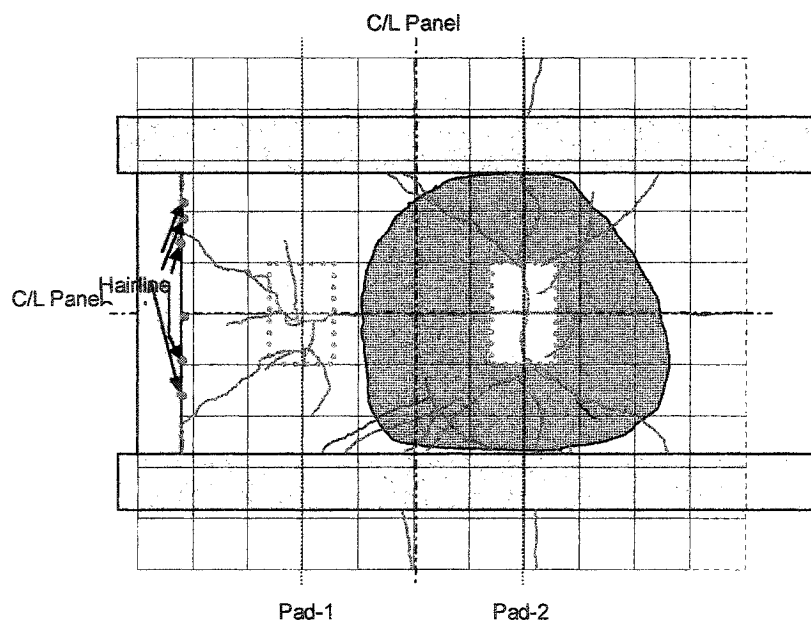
Panel-A: Crack Pattern on Soffit after Failure
